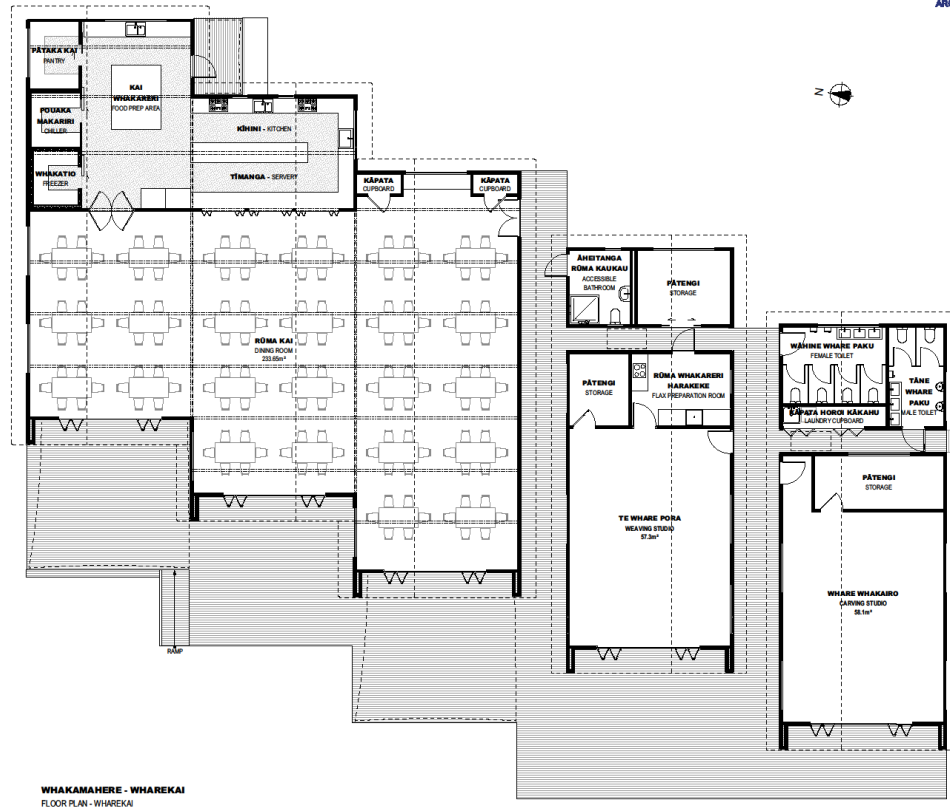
Wharekai Complex Floor Plan Incorporating Whare Whakairo and Te Whare Pora.
